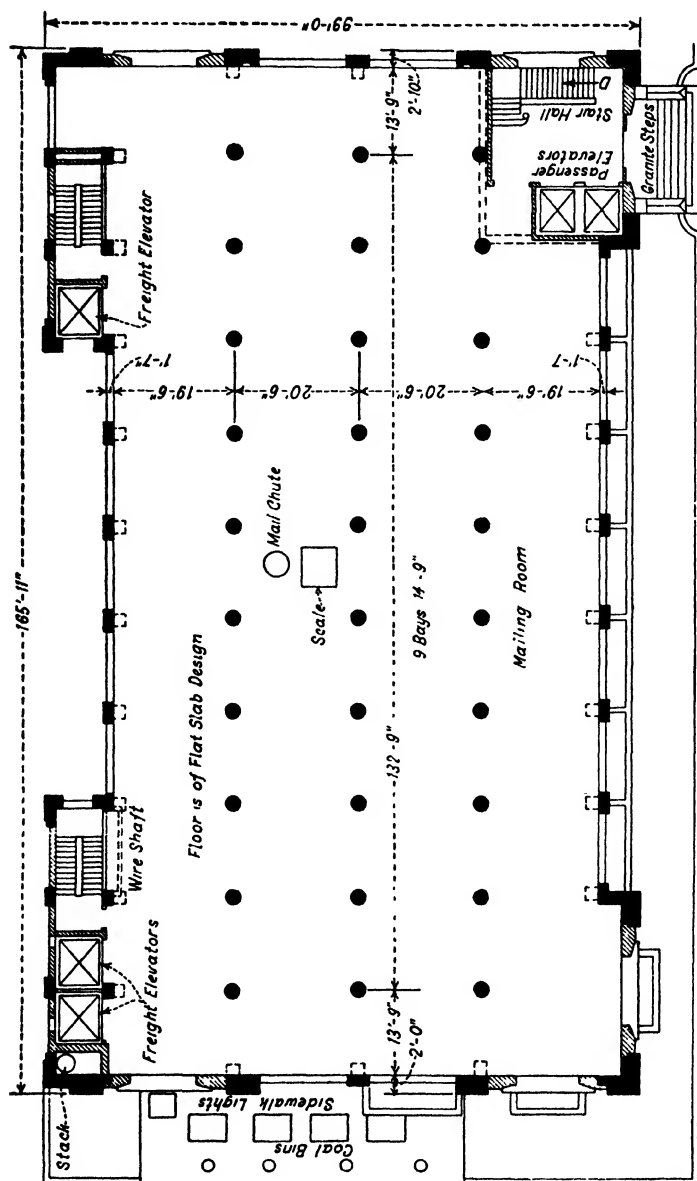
First Floor Plan. Youth's Companion Building, Boston. (See p. 793.)
